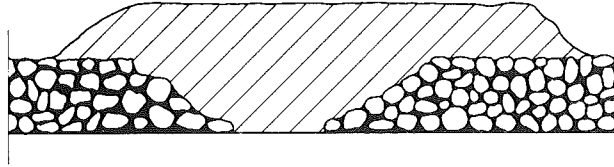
Repairs to a fully grouted crushed stone layer under water.
